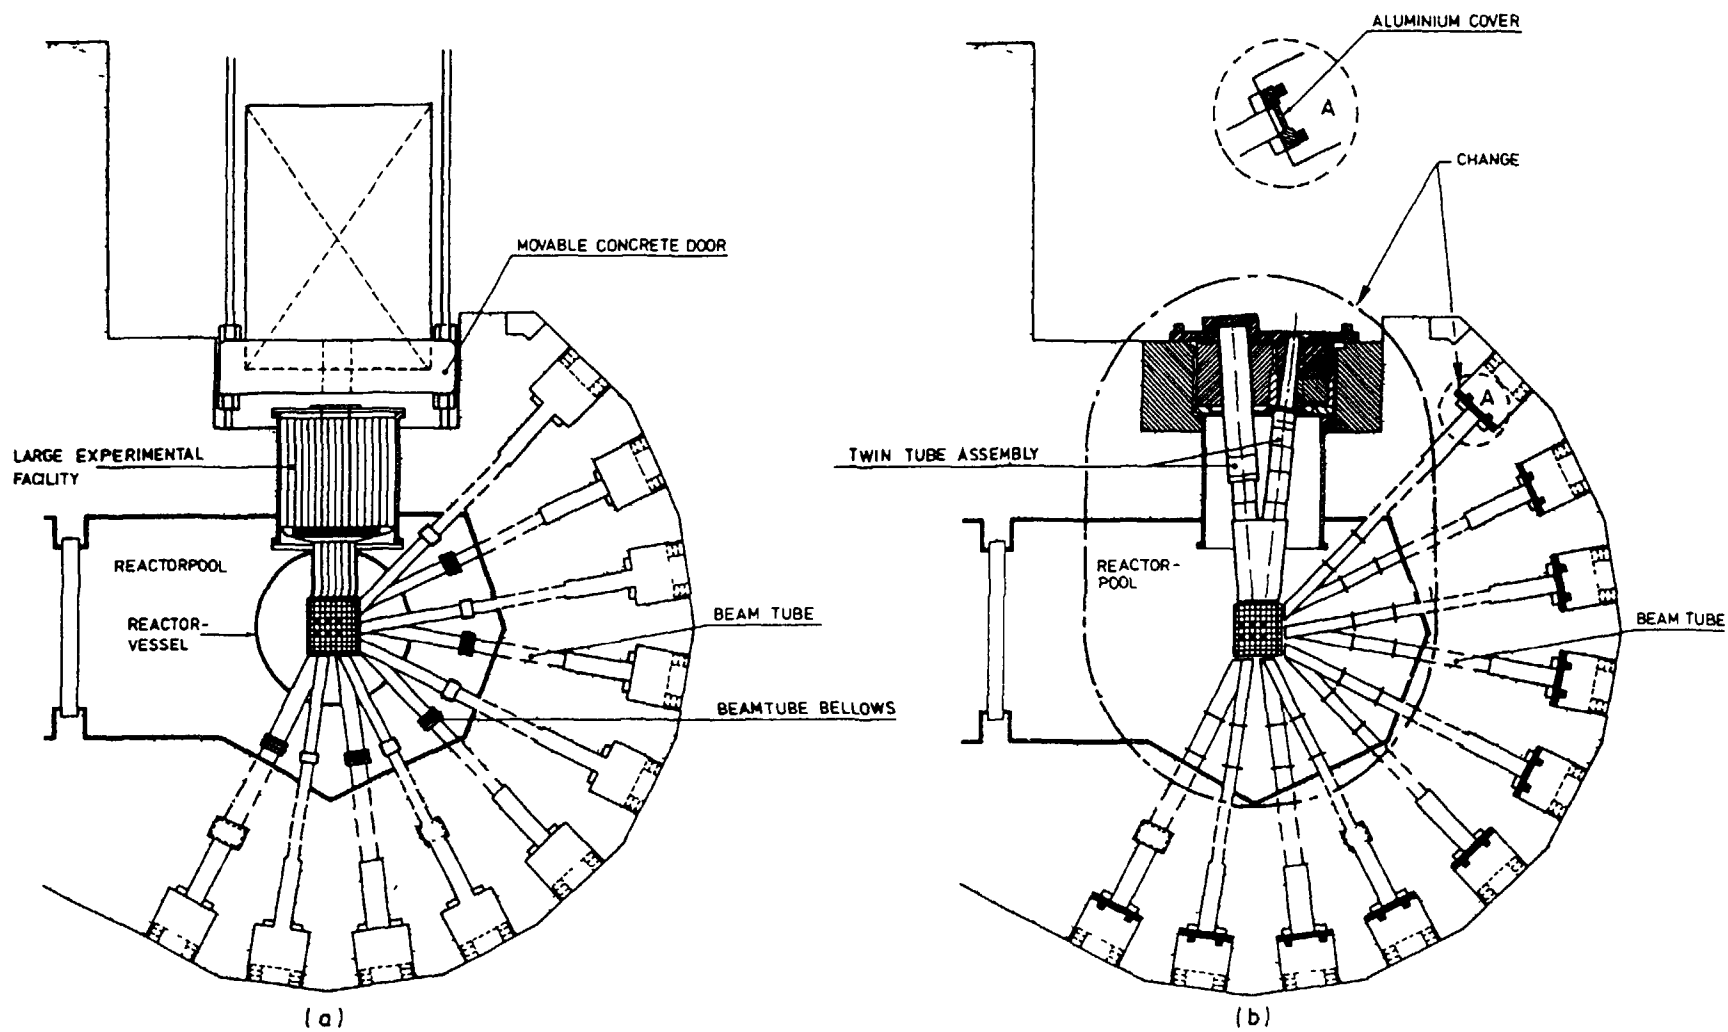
Schematic horizontal cross-section through HFR Petten reactor vessel and beam tubes: (a) original design; (b) improved design.
